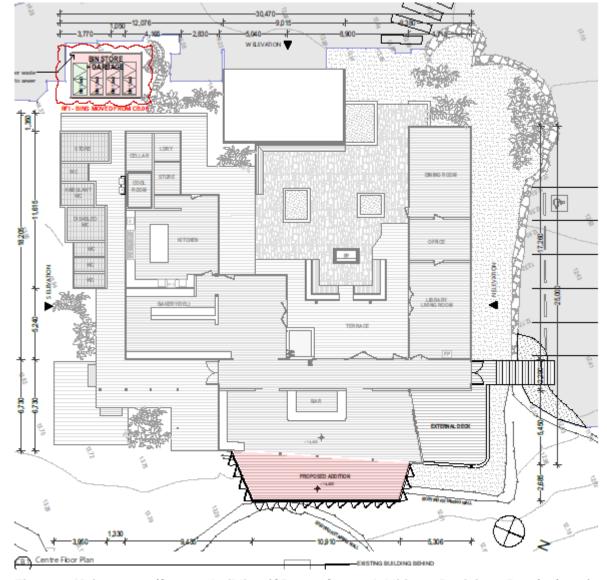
Maintenance/Storage building (CB.01 - Centre Additions, Revision 15, 27/09/2022).
